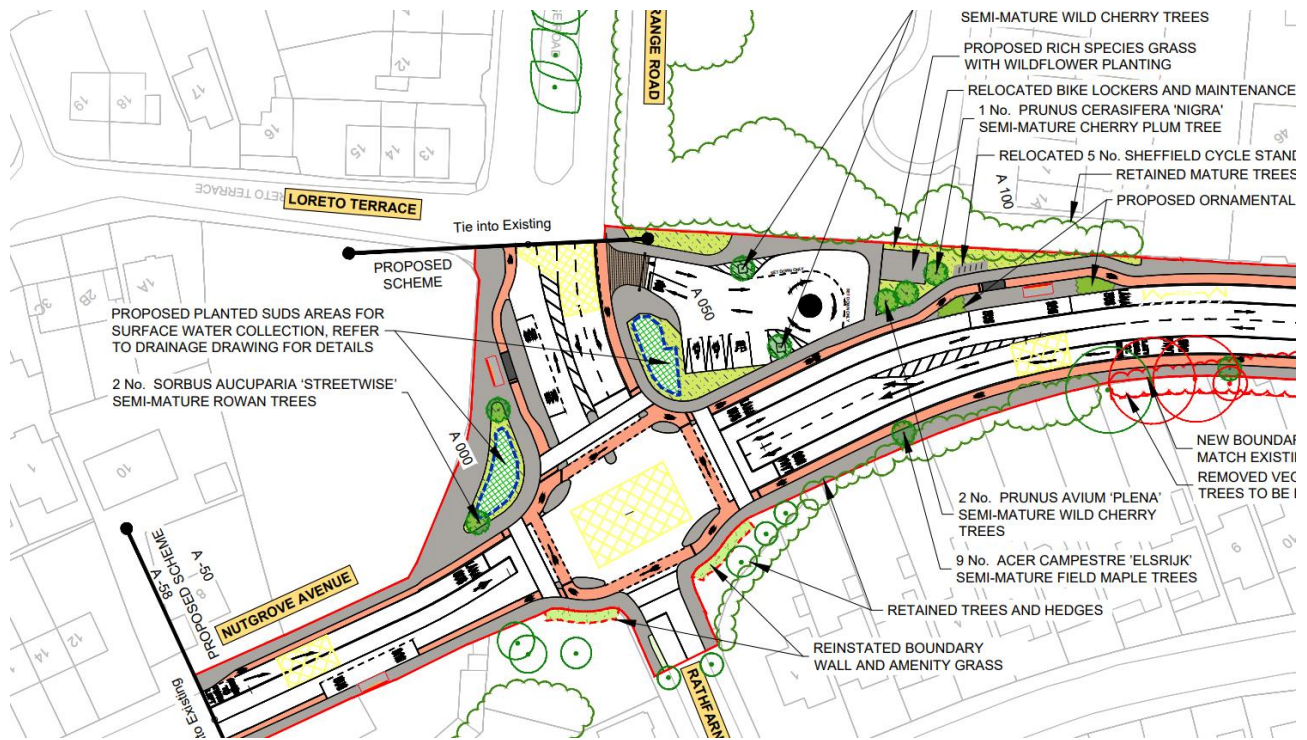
Extract from Landscape General Arrangement Drawings at Grange Road / Rathfarnham Road junction Rathfarnham Castle Park
